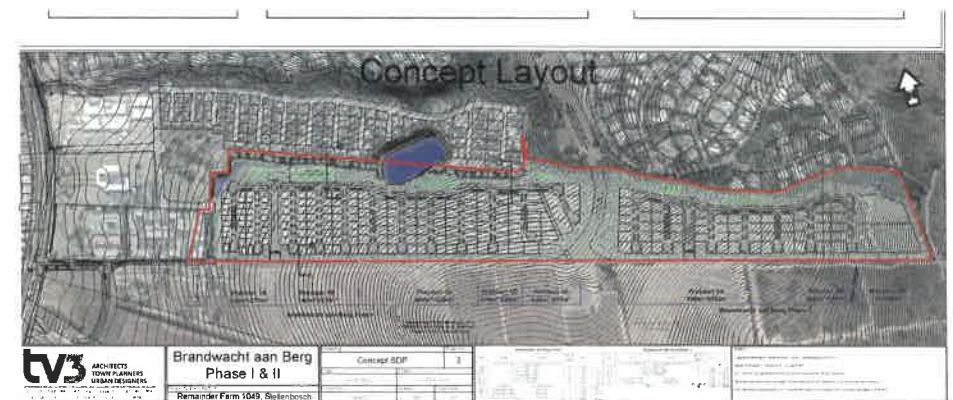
Rendering of proposed 'Development Alternative' Source: Project Planners and Architects
